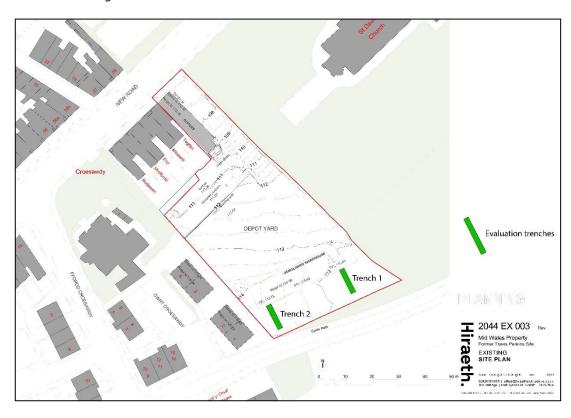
Detailed plan of the Development Site showing trench locations in green
